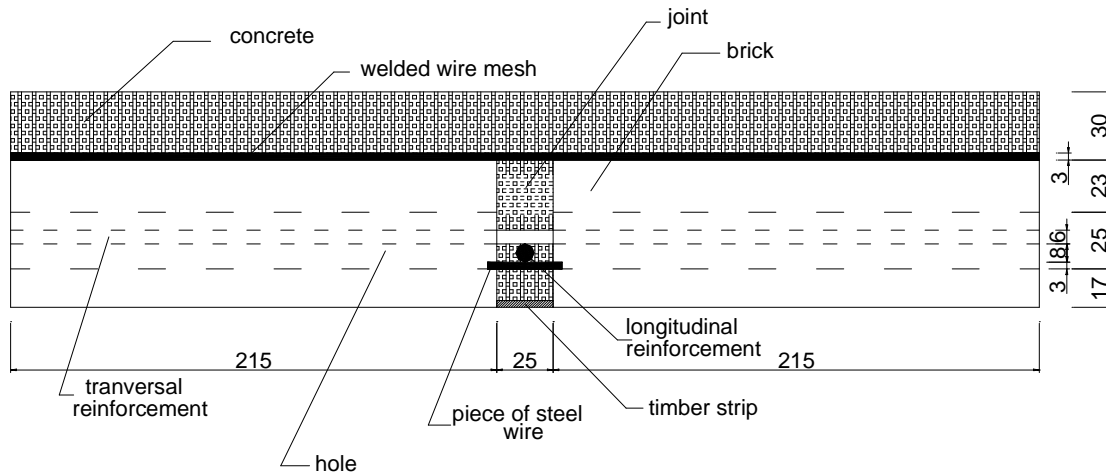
Detail of transversal section (B-B in Fig 6) of brick masonry shell, (dimensions in mm).
